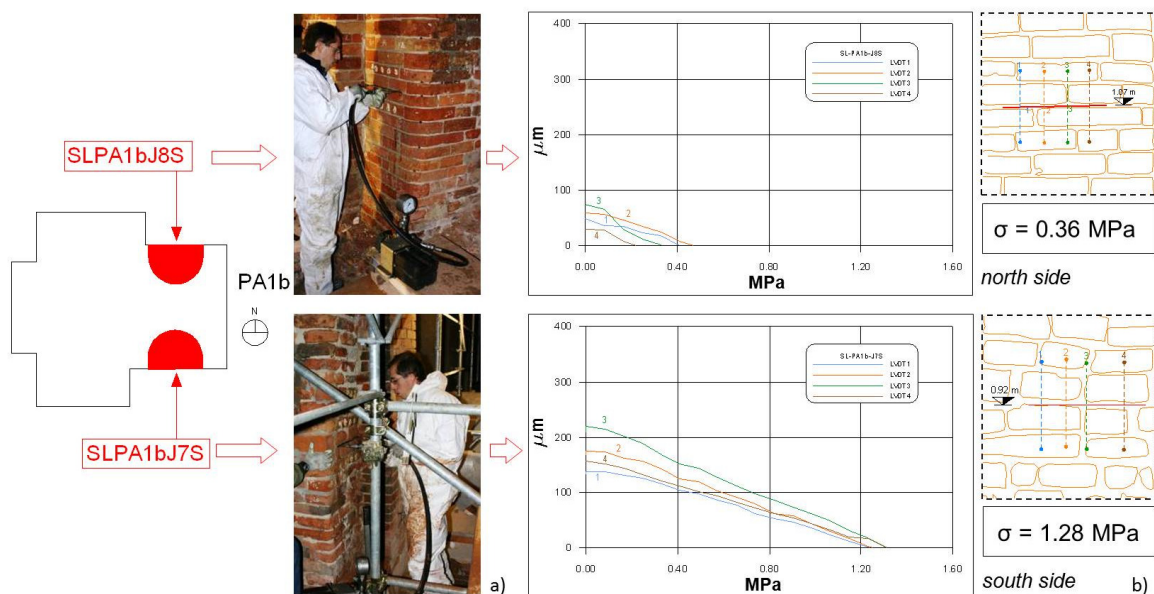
Eccentricity detection through single flat jack tests carried out on the opposite sides of a pillar: a) test layout with pictures; b) results with the layout of each test (layout, pictures and elaborations by the author).
